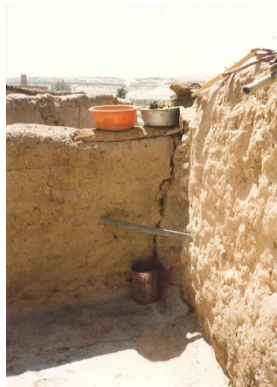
A large crack separating two walls at the corner in one of the vernacular dwellings in Taghit.
